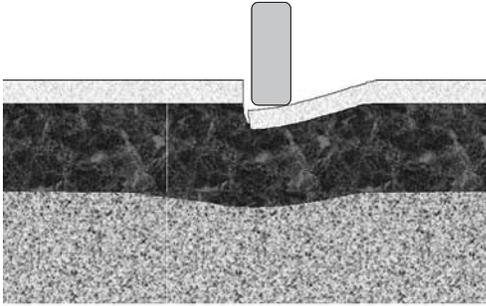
Longitudinal joint faulting mechanism in ALF UTW slabs.
